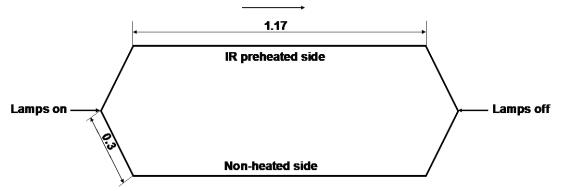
Schematic of the printed hexagonal sample (all dimensions in m), sample height: 0.25 m.
